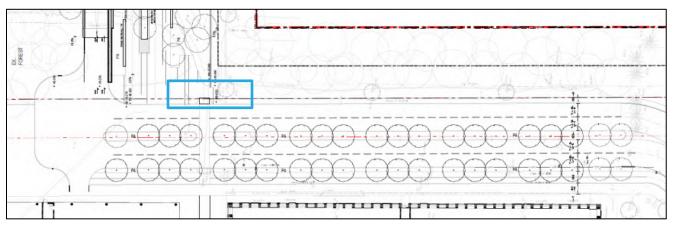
Proposed Roadway Accessing Gatineau CHCP
